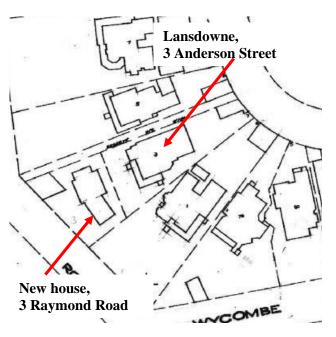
1959 Water Board detail series plan showing the subject property following subdivision and the construction of the new house on the southern allotment. (Source: Sydney Water Plan Room GML)
